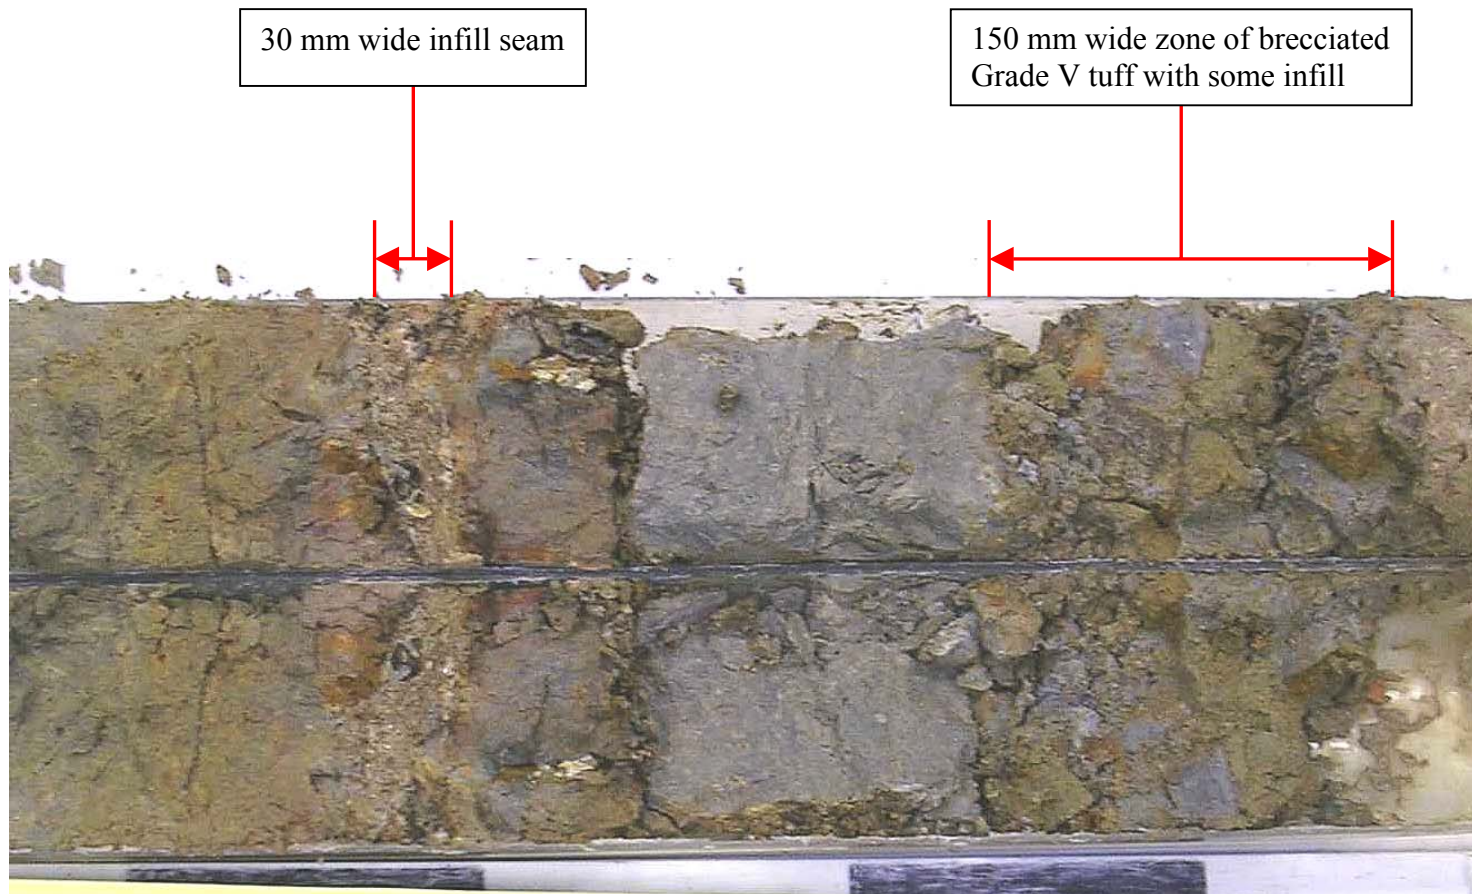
View of Infill Seams in Drillhole BH2 at Depths of 8.7 m and 8.85 m
